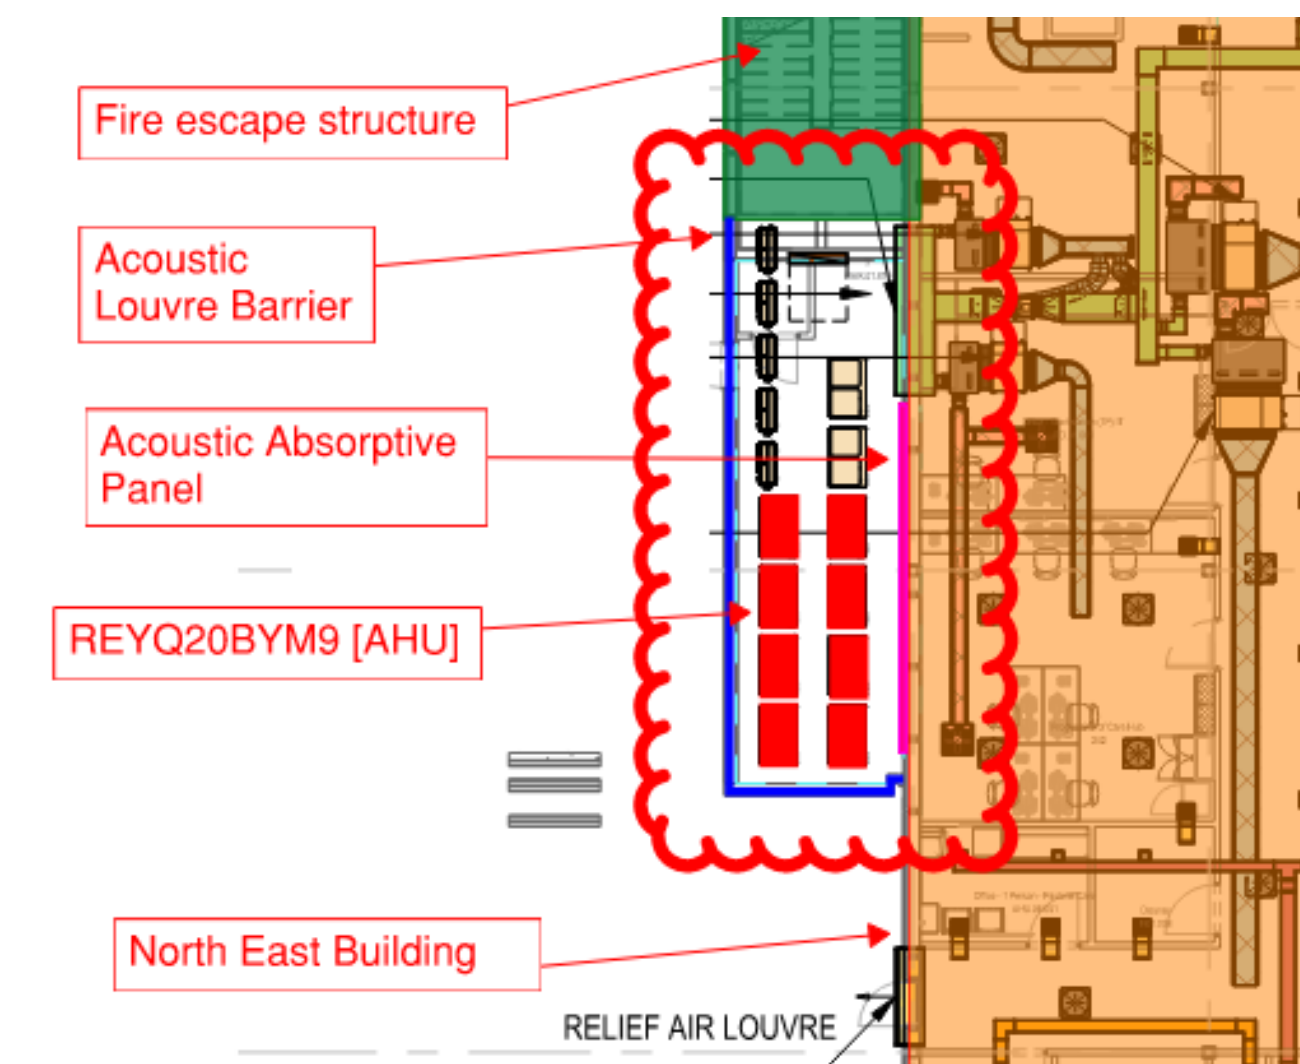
Proposed acoustic barrier location and mechanical plant equipment/enclosure
